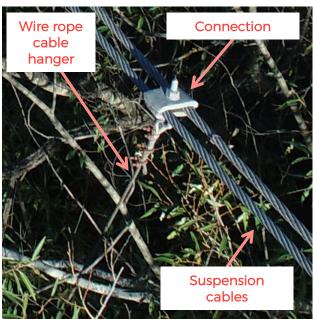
Typical wire rope cable hanger top connection to suspension cables
